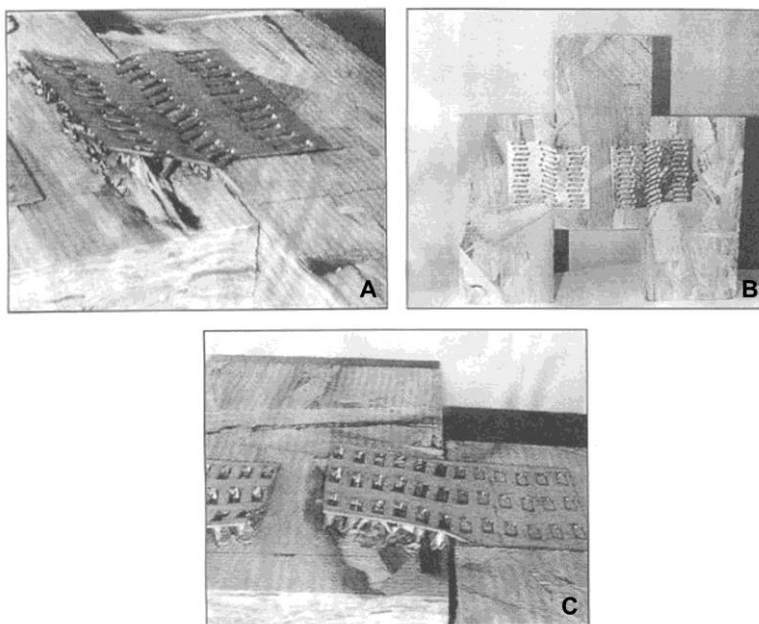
A. Wood failure in shear testing, B. Steel net section failure in shear testing, C. Tooth withdrawal failure in shear testing
